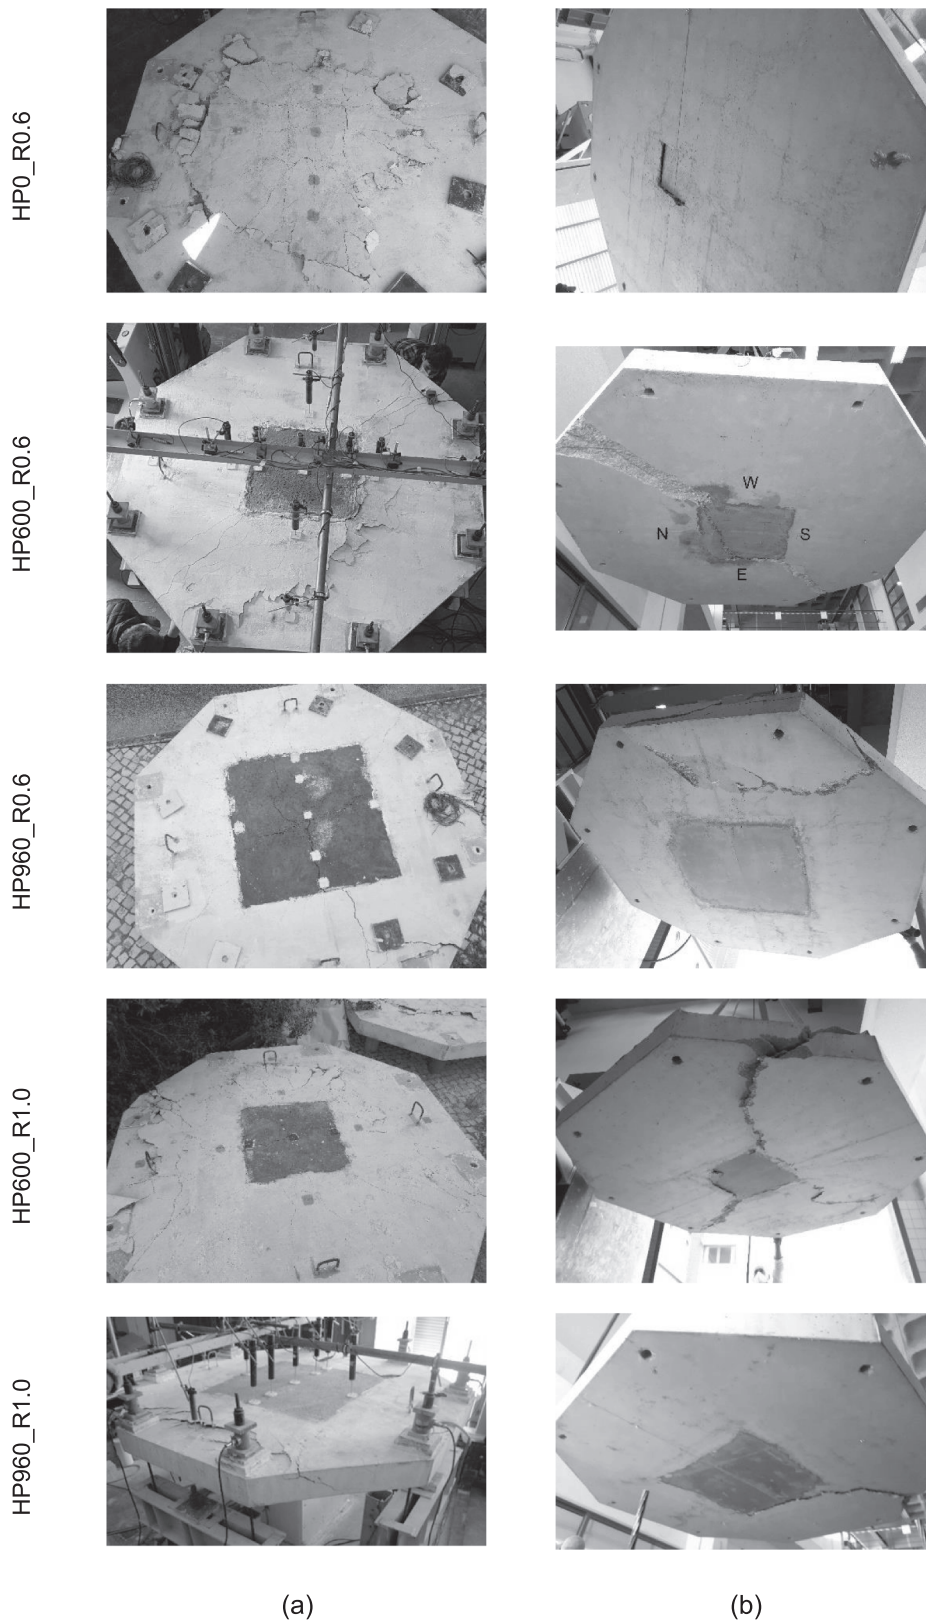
Specimens after failure: a) top surface; b) bottom surface.
